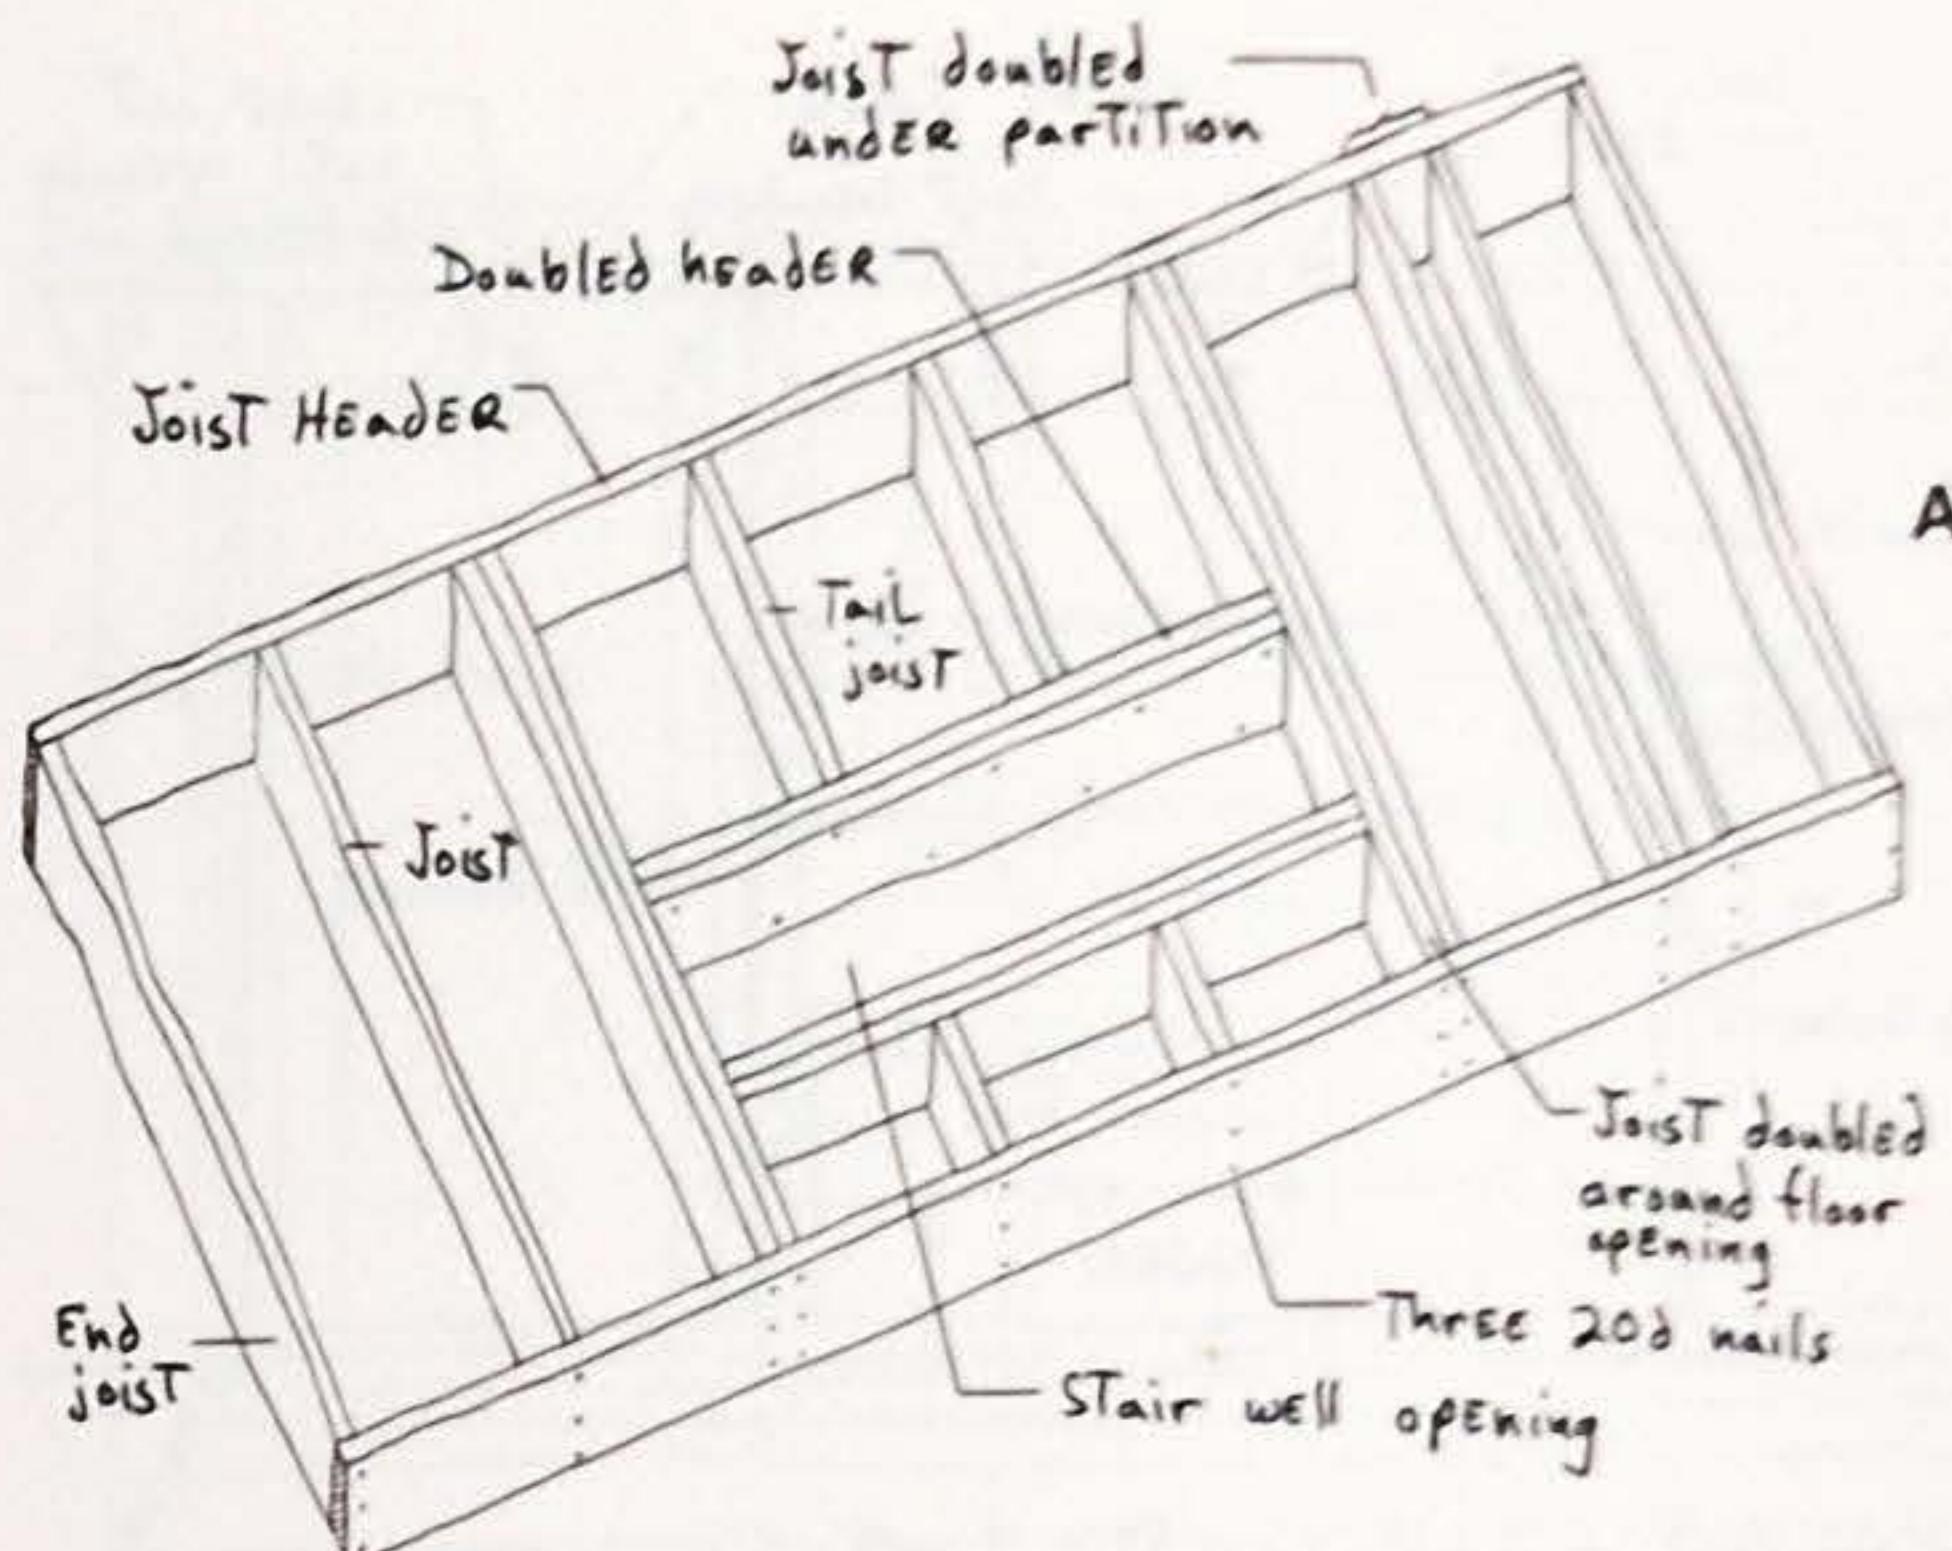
JOIST STRUCTURE for a SMALL HOUSE
